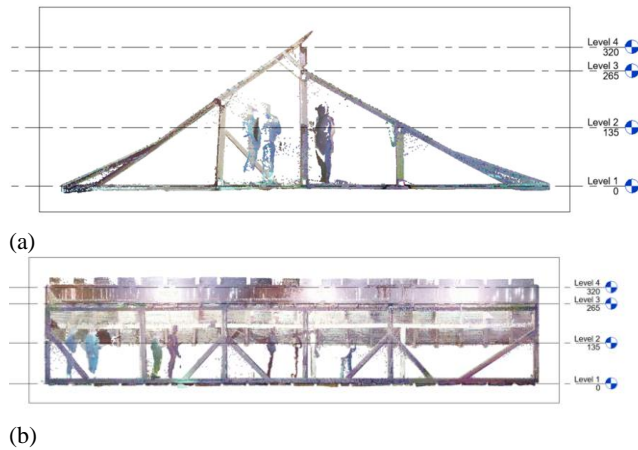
The sections of the analysed structure: (a) cross-section; (b) longitudinal section.
